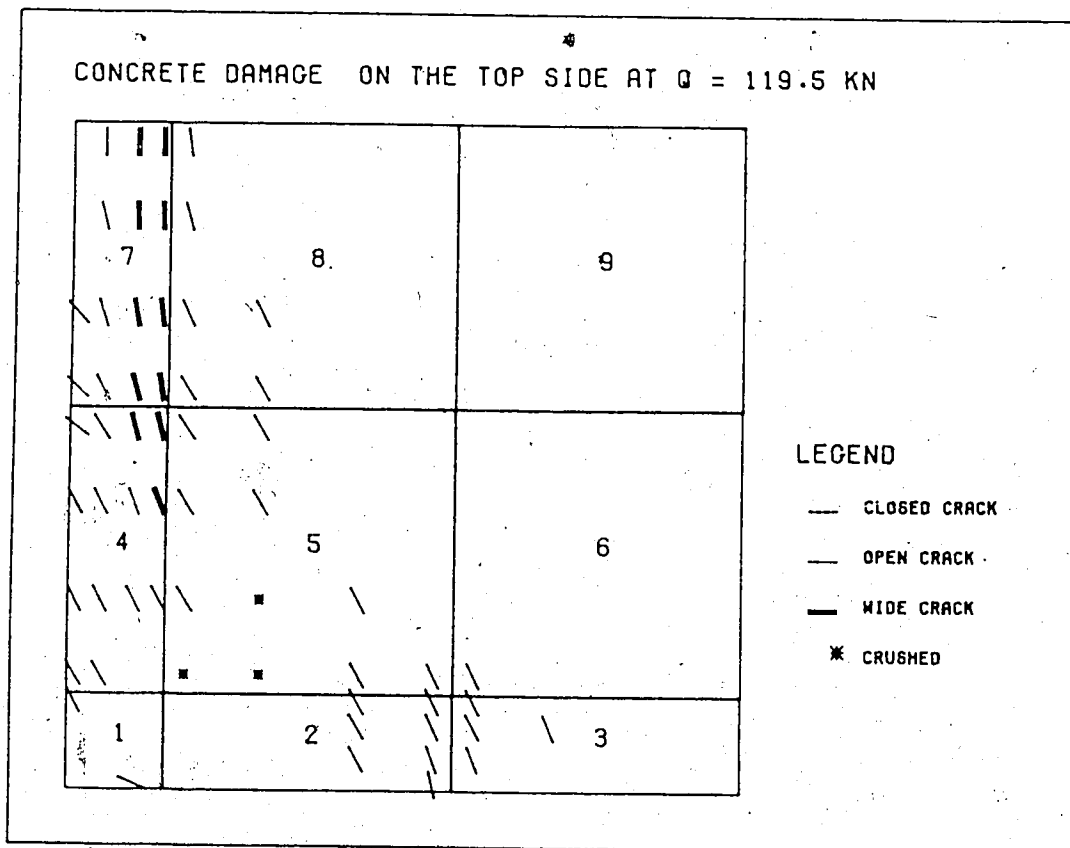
Concrete damage in Aghayere and MacGregor (1988) specimen A2 at peak load
